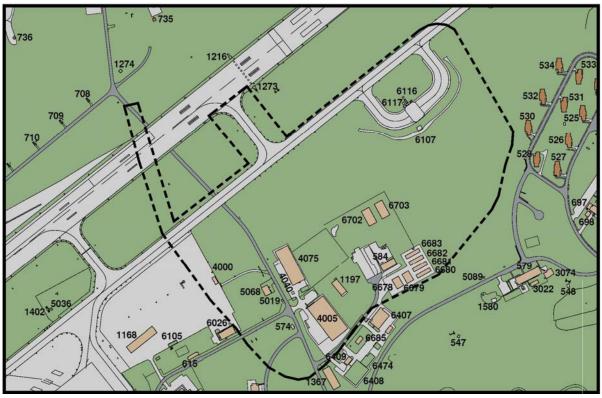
Partial site plan of MCB Hawaii Kaneohe Bay illustrating site C. The facilities within the dashed boundary are proposed for demolition. A MV-22 Aircraft Maintenance Hanger, an aircraft parking apron, a MCAS OPS complex, a new sewer pump station, wash rack, and a POV parking lot. Also, the road will be realigned and a new sentry station will be added.
